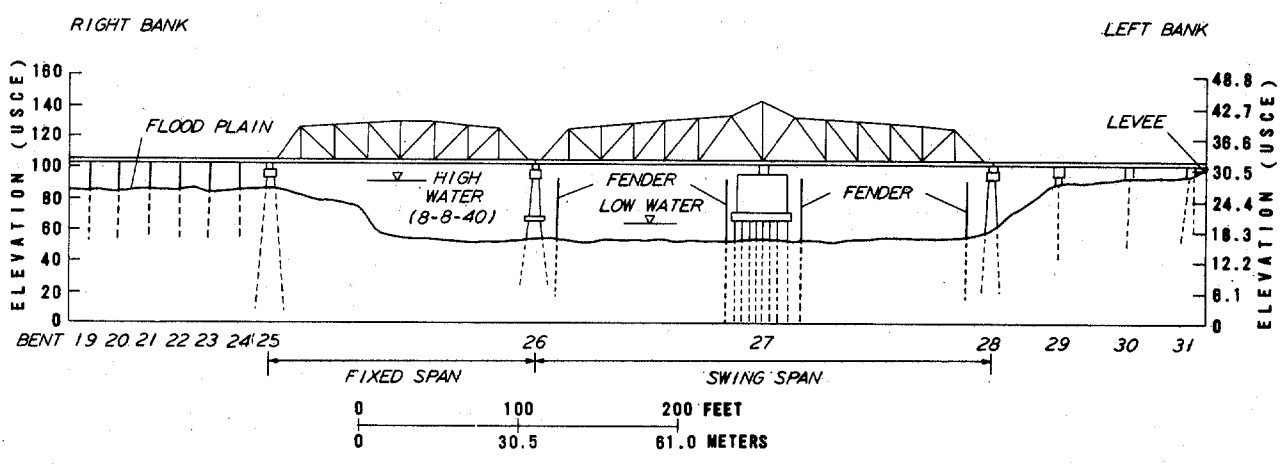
Cross section of bridge across main channel of Sacramento River on SR-162 at Butte City.
